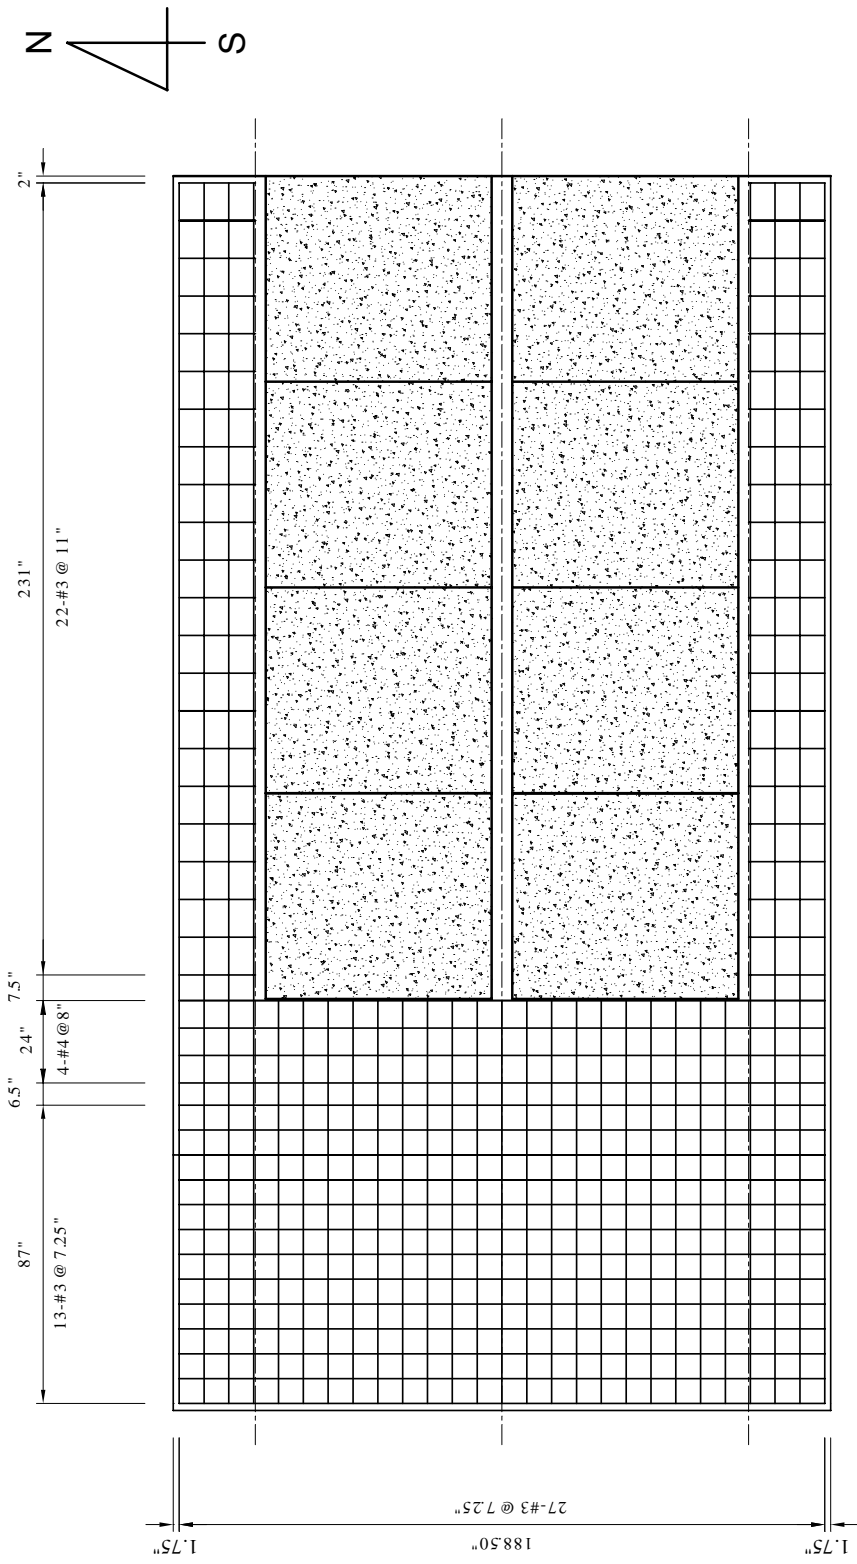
Plan View of Bottom Reinforcement (Support to Support Only)
